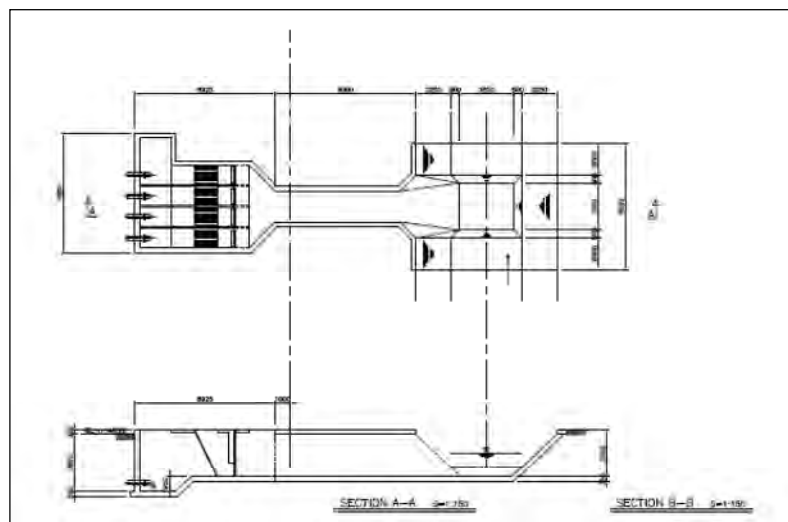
Outline of Intake Facility in Wahalkada Wewa
